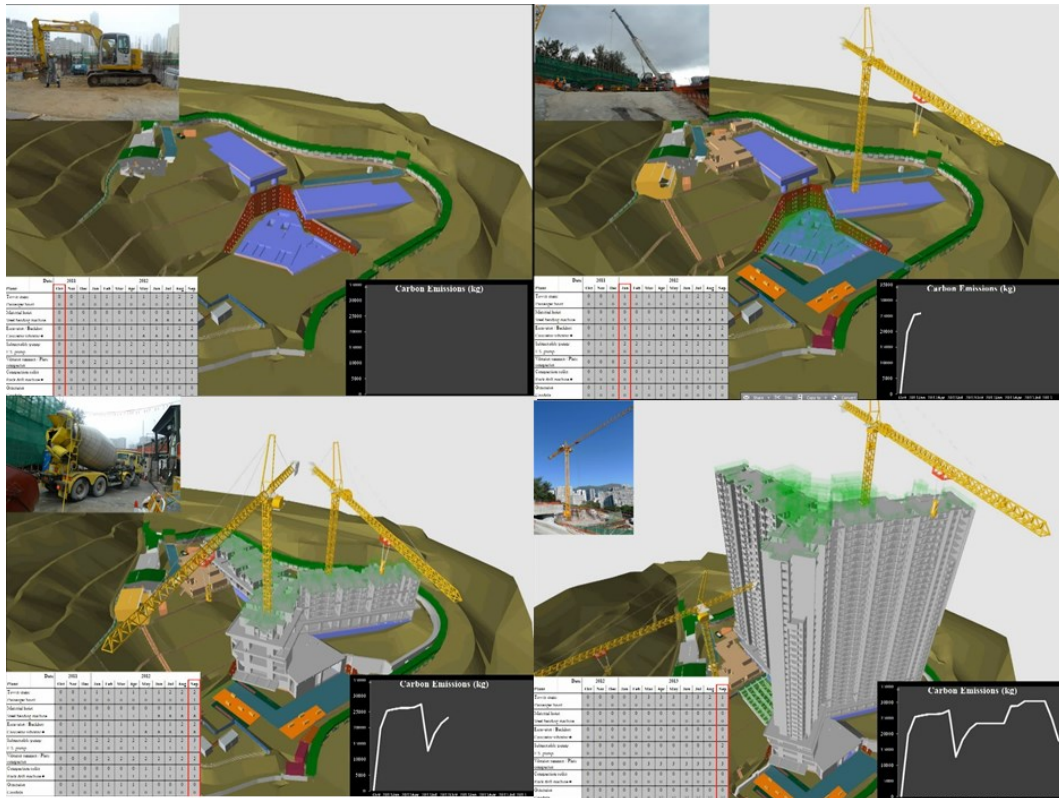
4D simulation models with CO₂ emission (estimated) rate of plant/equipment in different phases of the Public Housing Development Project: (a) foundation construction; (b) lower floor construction; (c) typical floor concreting work; and (d) rooftop construction.
